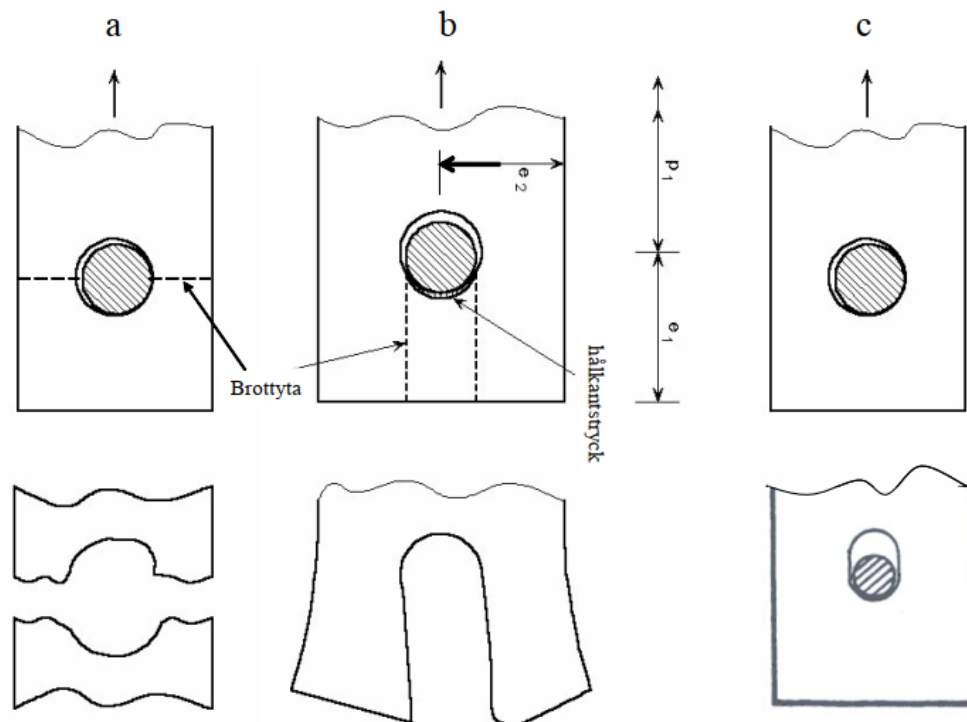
Failure modes of a laterally loaded steel bracket (Al-Emrani et al., 2011).
